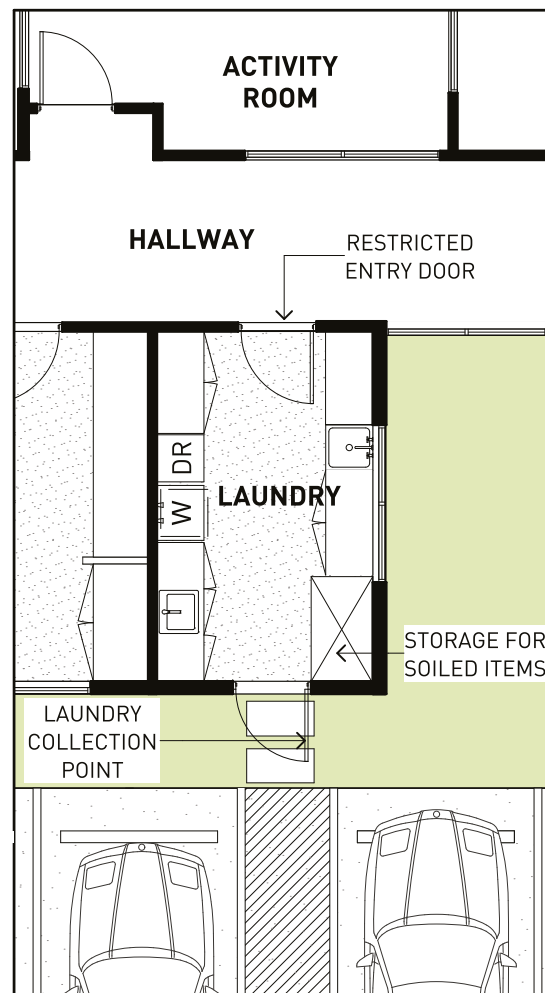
A typical child care facility laundry layout. External access may be provided if laundry is done off site or for deliveries.
